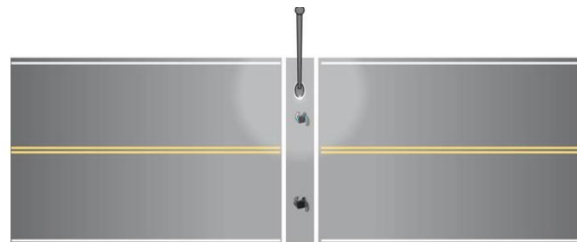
Drawing. Traditional midblock crosswalk lighting layout.
